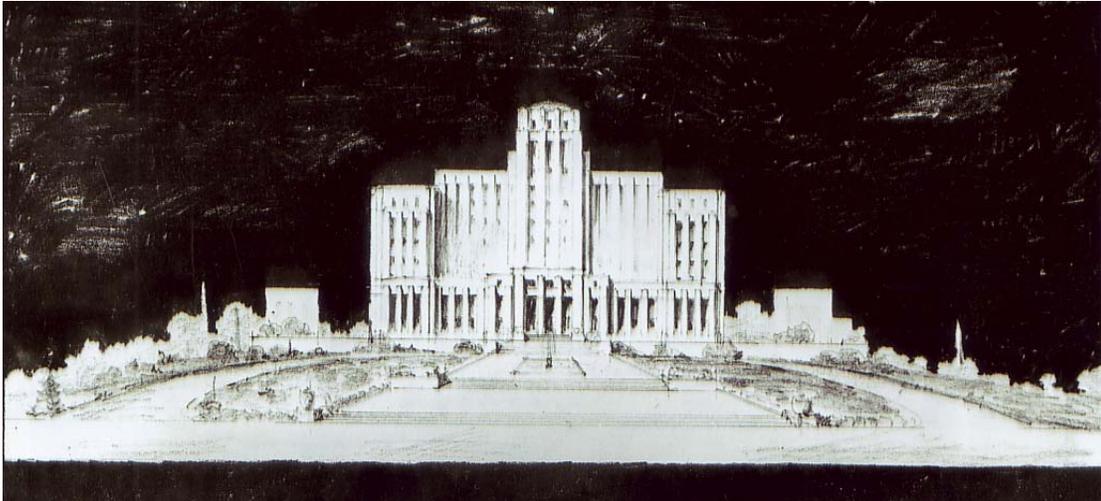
A second proposed plan for a new US Naval Hospital, Washington DC (NARA College Park).
